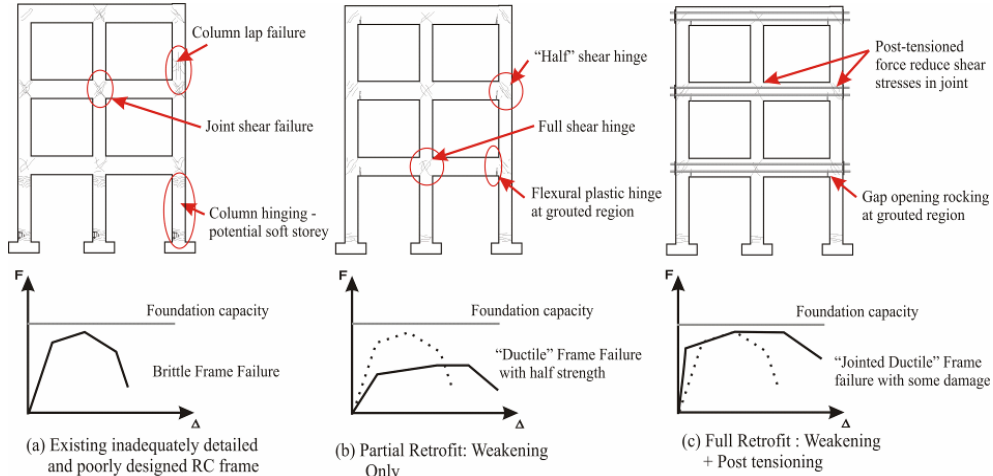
SW retrofit for rc frame: a) existing RC frame b) cutting the bottom longitudinal bars to reduce joint shear stress c) post-tensioning joint and weakened b-c joints.
